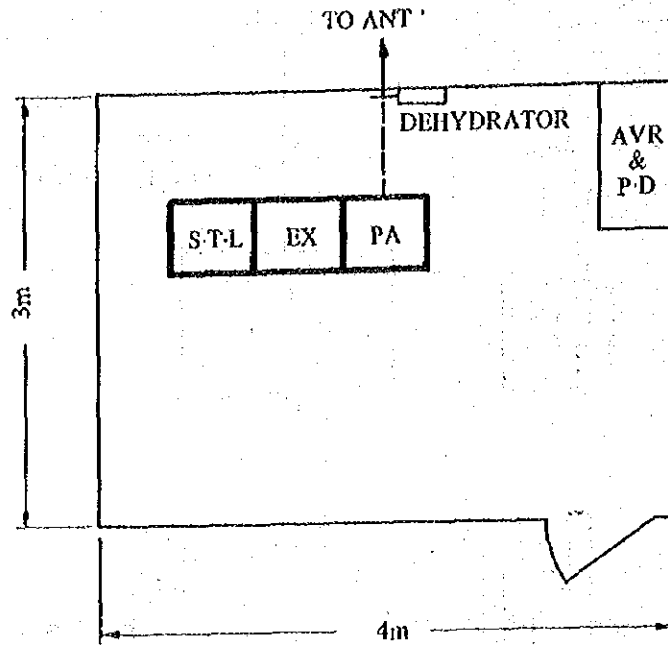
Floor Layout of 30~100W TV Transmitting Station
